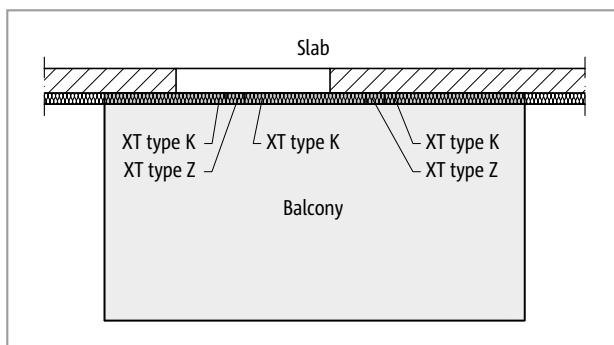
Schöck Isokorb® XT type Z, K: Balcony freely cantilevered
